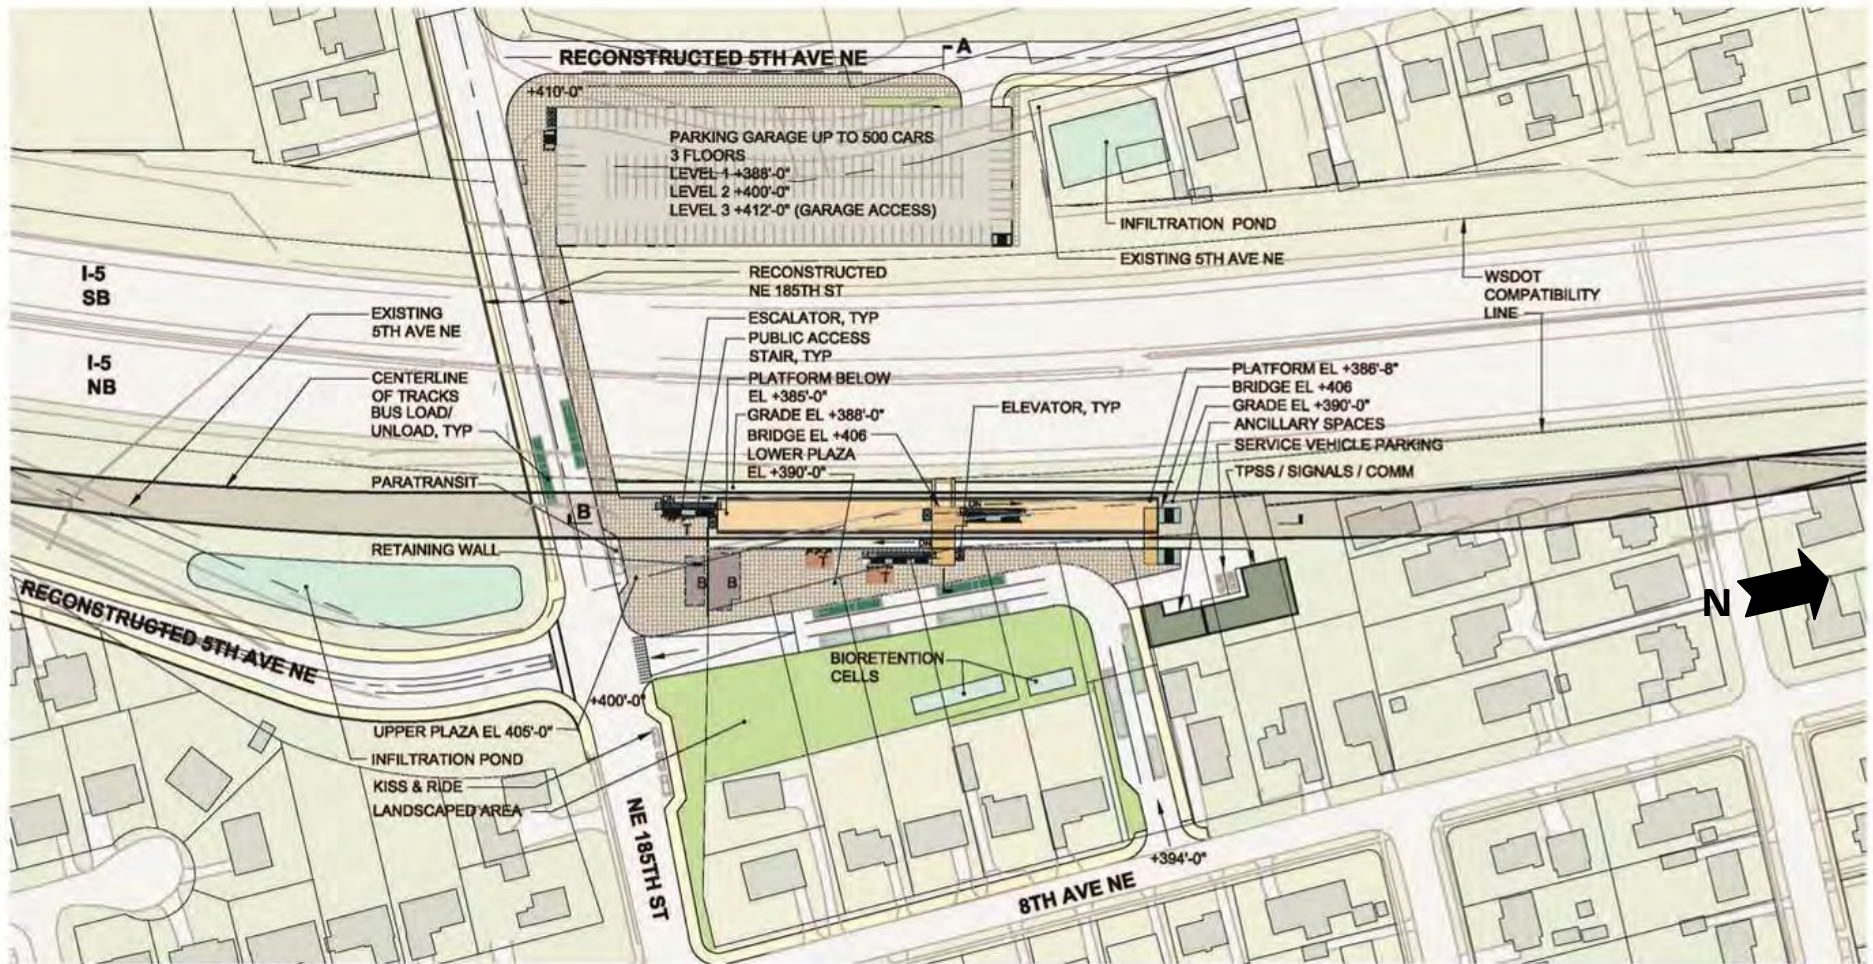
Sound Transit’s Conceptual Design Plan for the 185th Street Station
